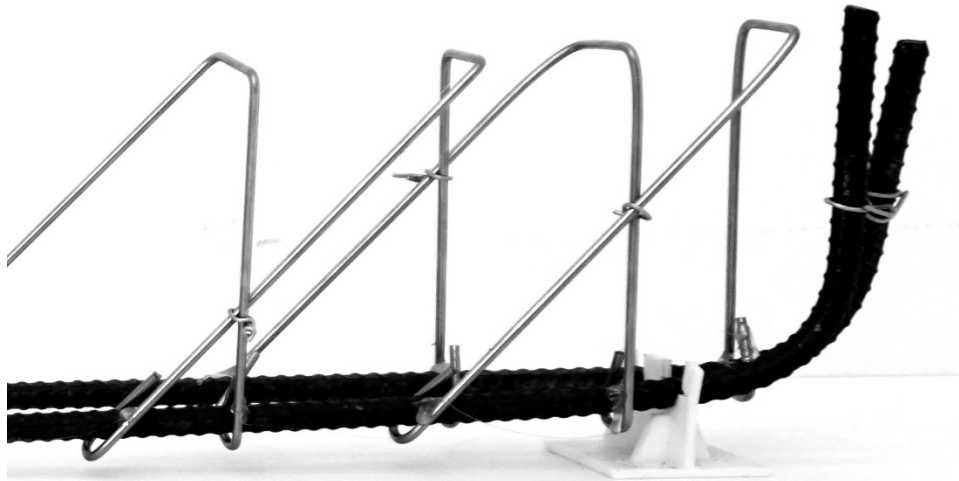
Detail view of 3D printed rebar chair supporting steel reinforcement
